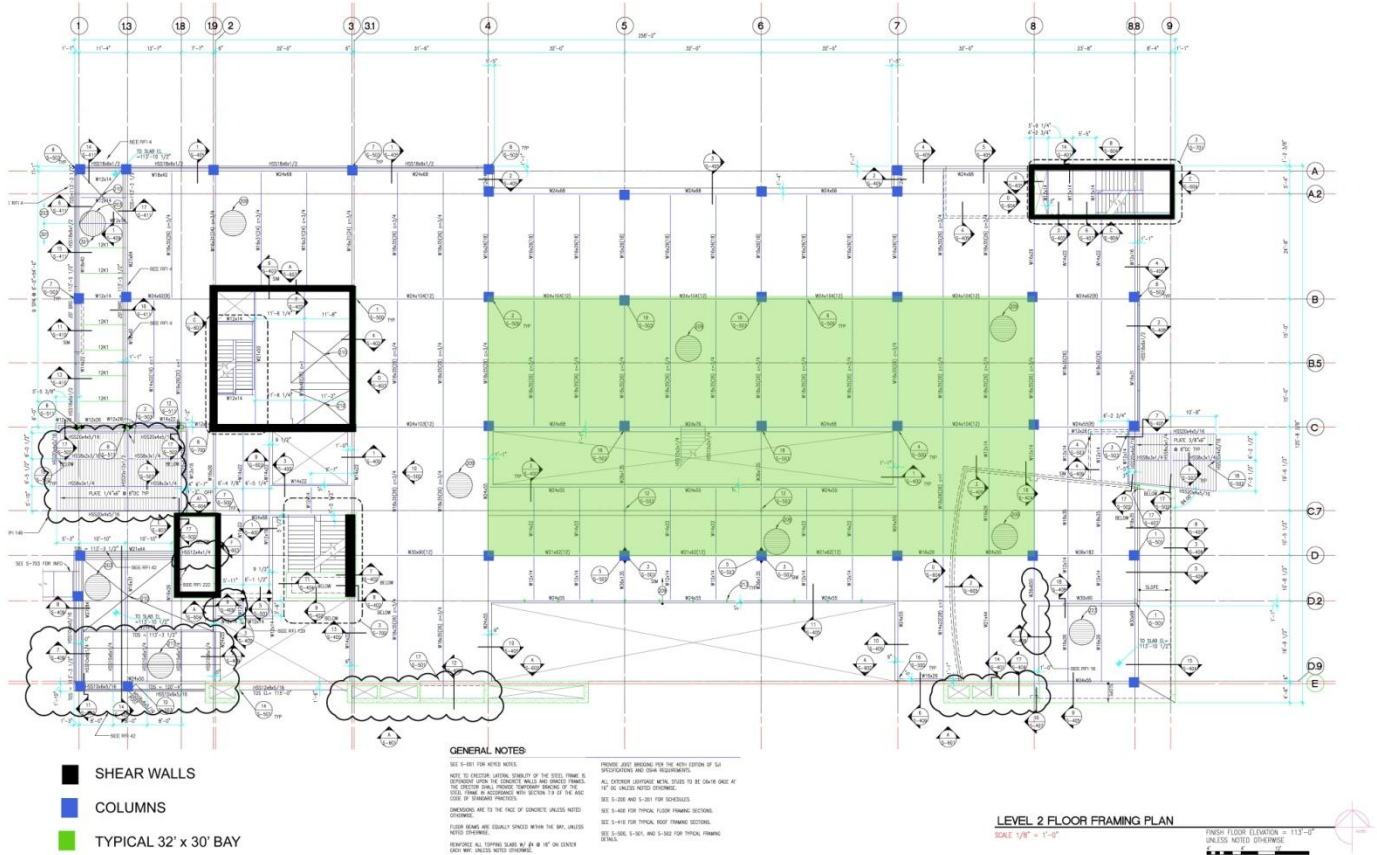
Framing Plan-Level 2 Plan showing shear walls and column layout. Modified by N. Trujillo. (Courtesy of Jon Anderson Architect)
